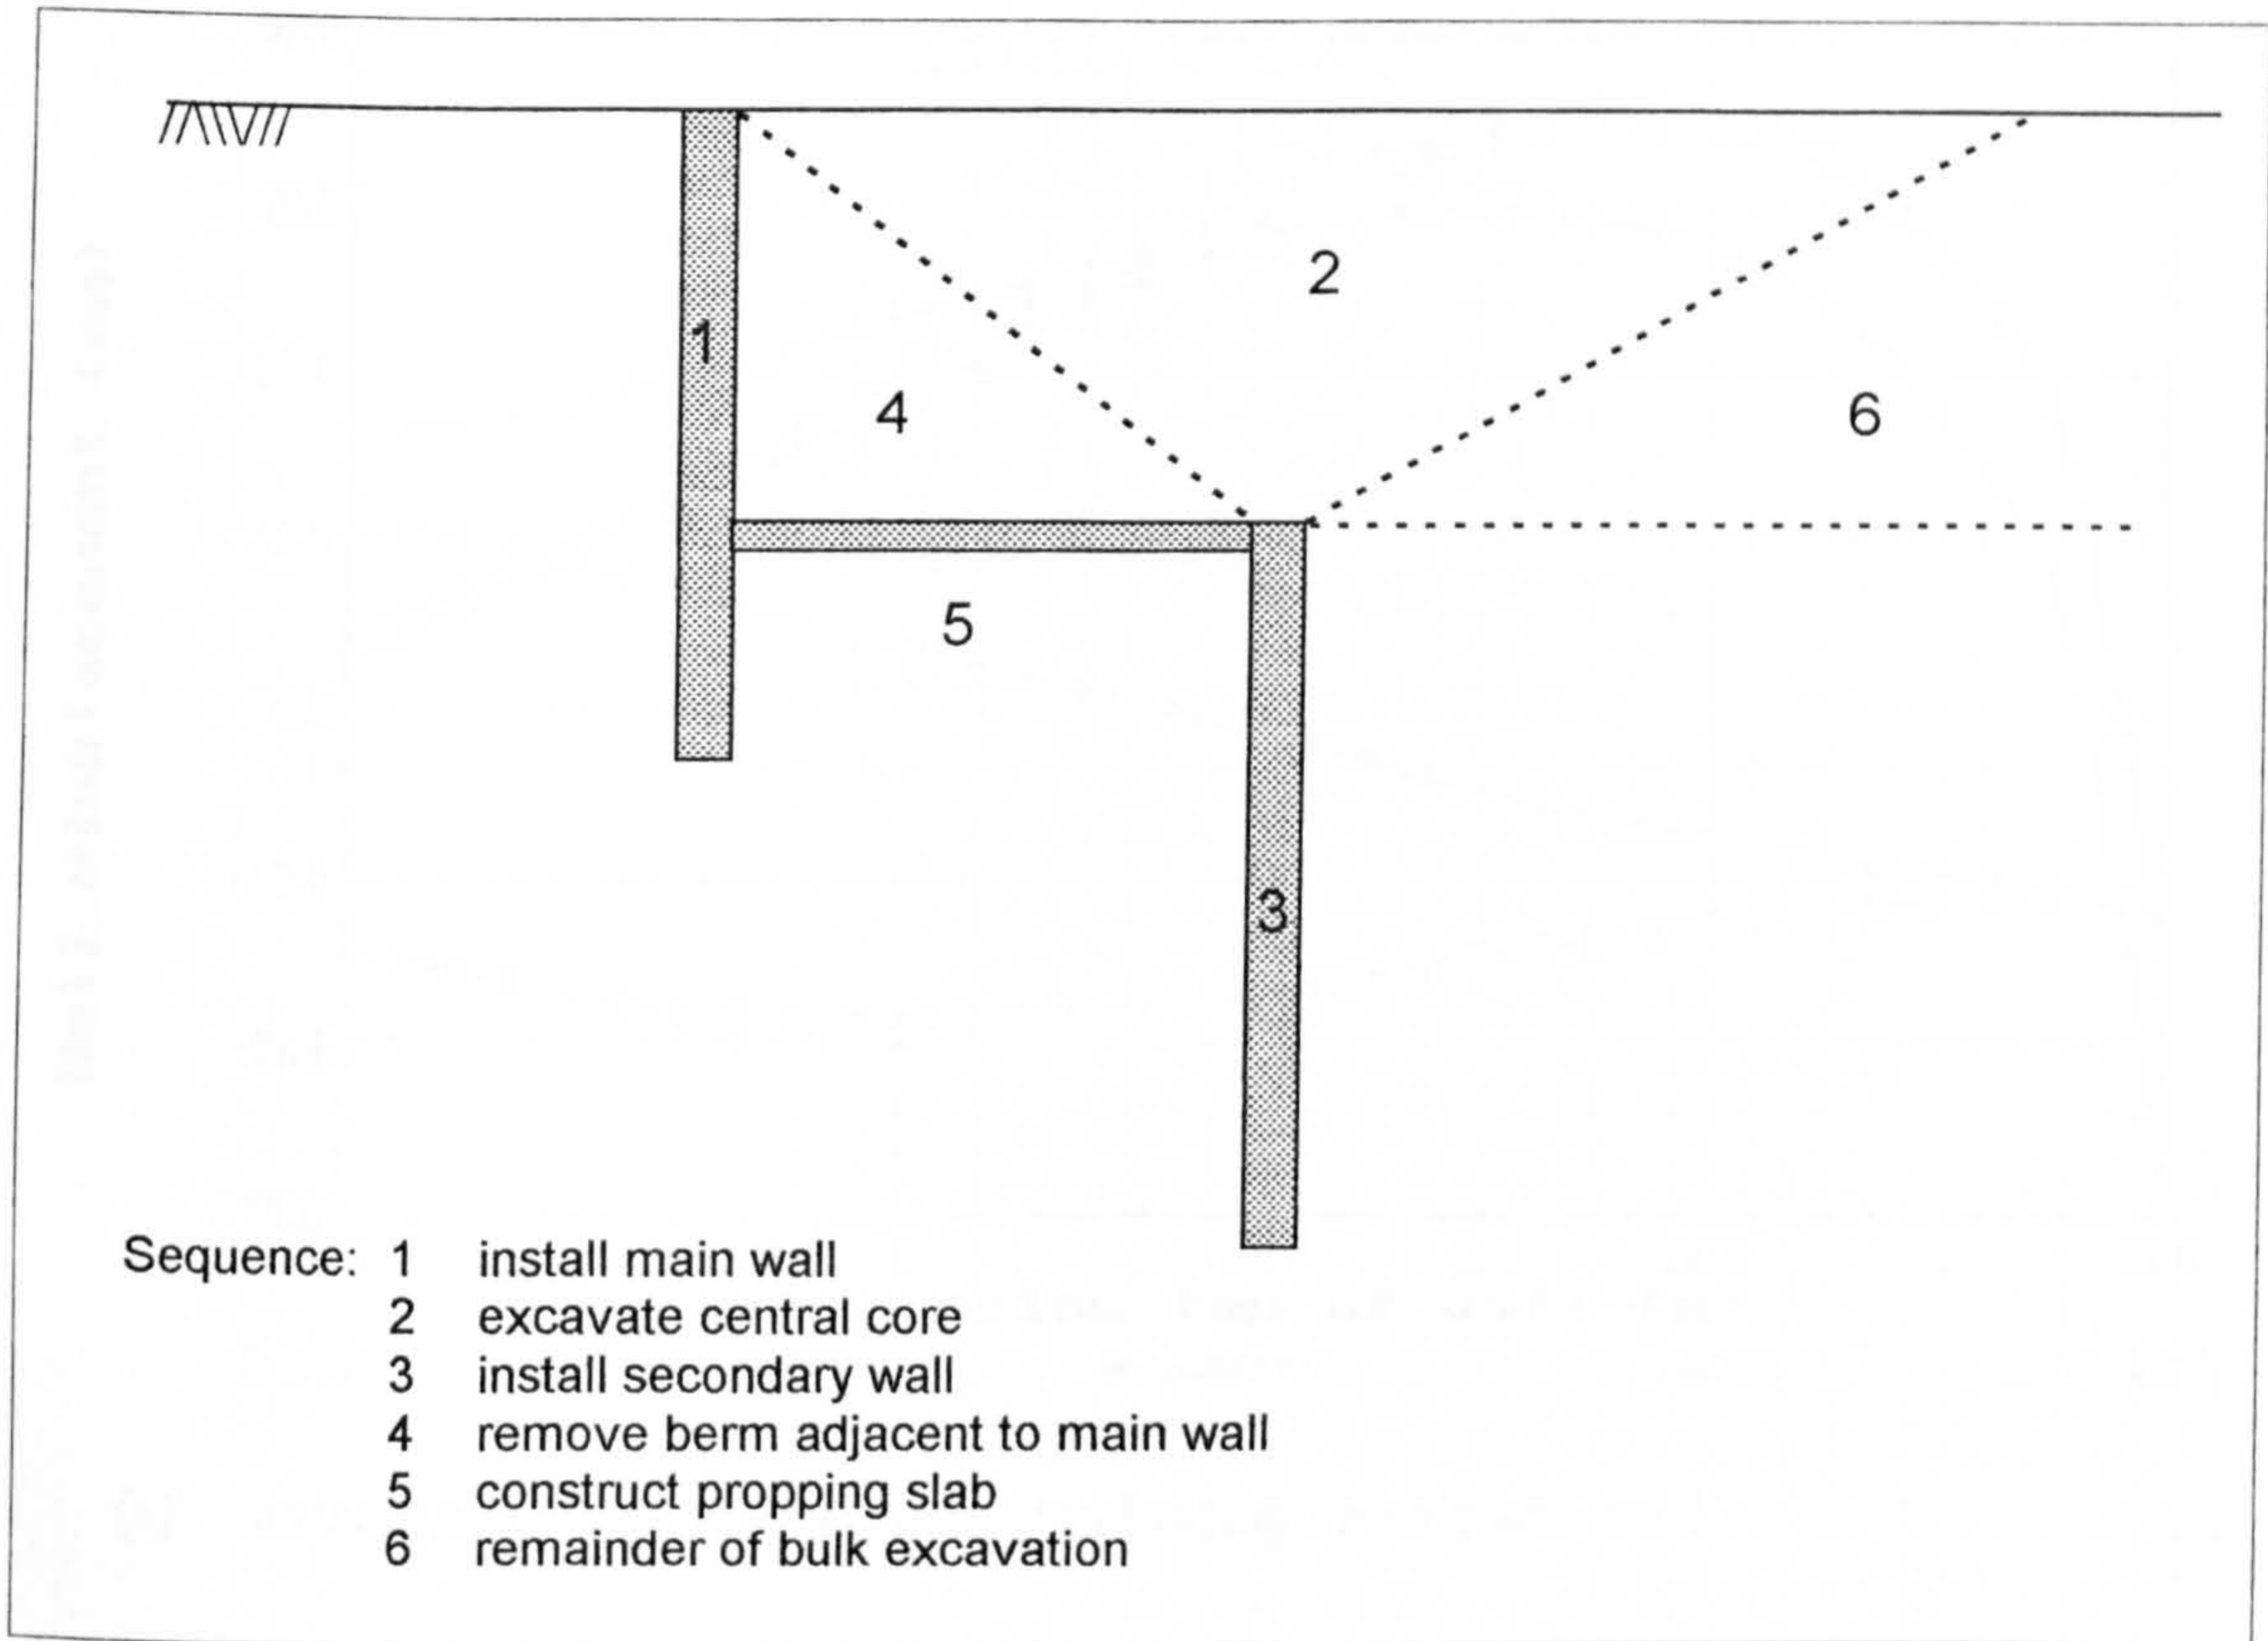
Bulk excavation prior to wall installation (A406/A1/A598 Junction)
